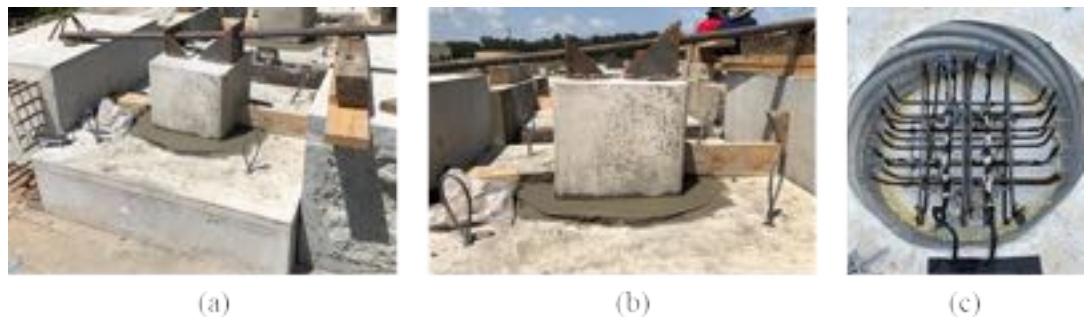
Construction of Socket Connection: (a) and (b) details of 18-inch pile and (c) reinforcement in the plug.
